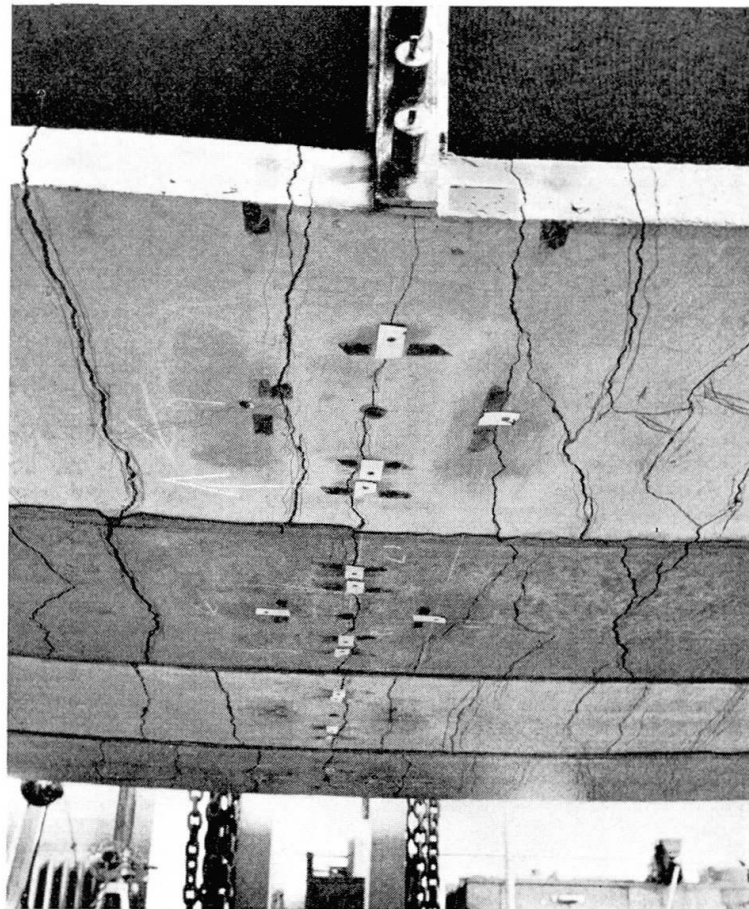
Box-Section Bridge — Crack Pattern on Soffit of Second Bridge at an Applied Load of 25 Tons.
